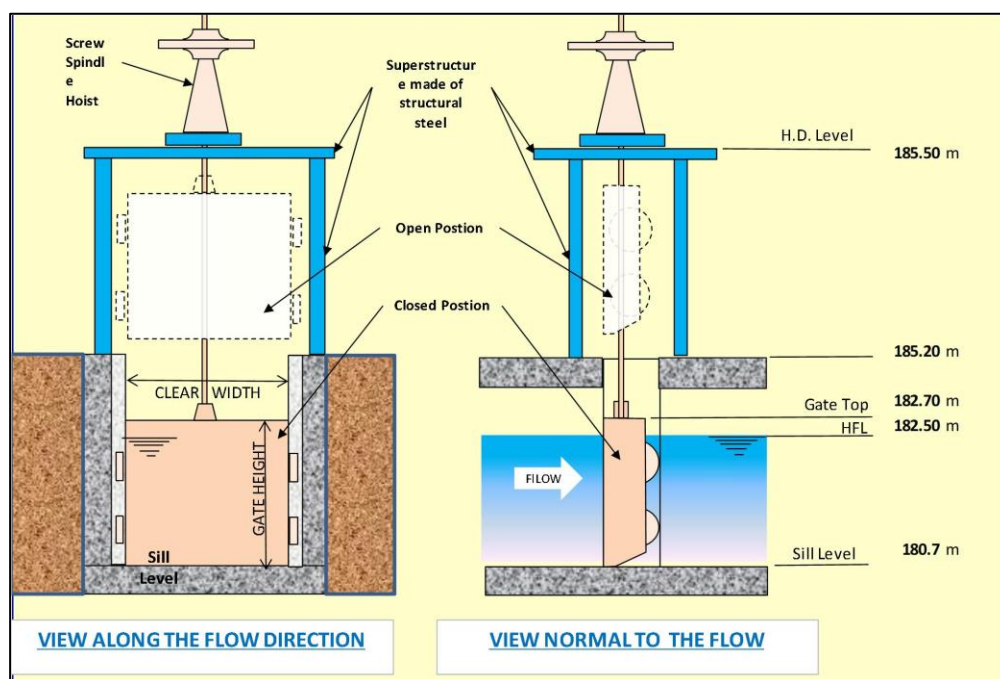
Sectional Elevation of Flood Flush Sluice
